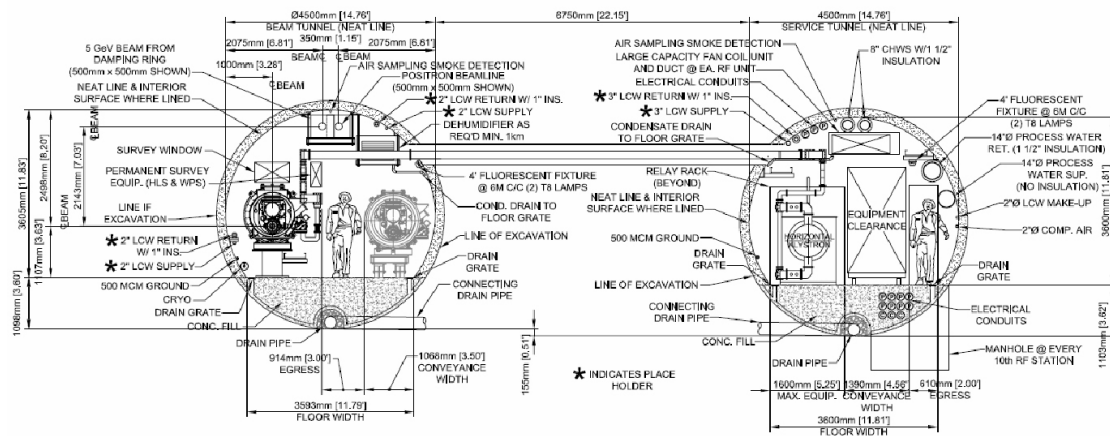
Cross-section of the Main Linac Housing (Beam Tunnel, left) and Service Tunnel, Showing the Connecting Waveguide Penetration
